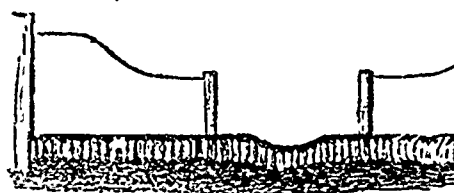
Cobble-Stone Pavement for Cow Houses.
